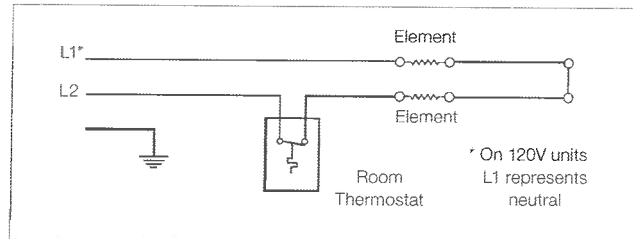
Wiring Diagram for remote mount and built-in room thermostats (1Ø units)
